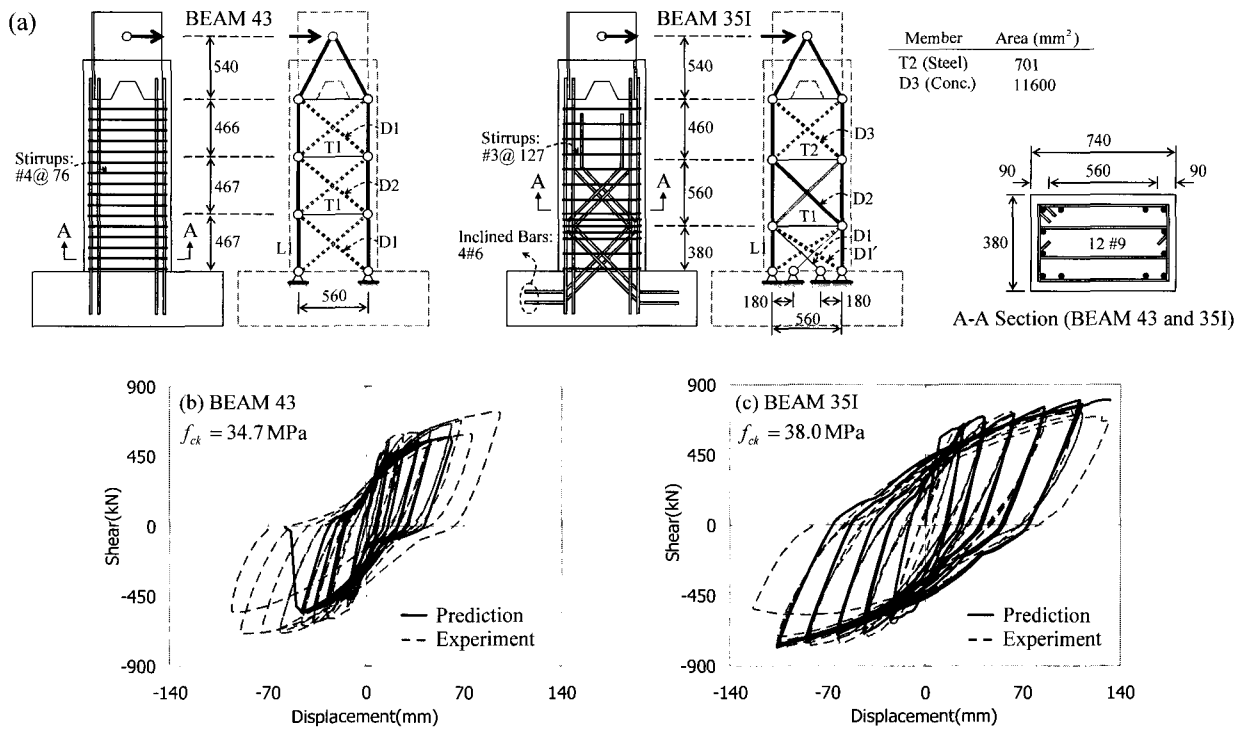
Prediction for Cantilever Beams^{26,27}: (a) Details and analytical truss models, (b) BEAM43 and (c) BEAM35I
